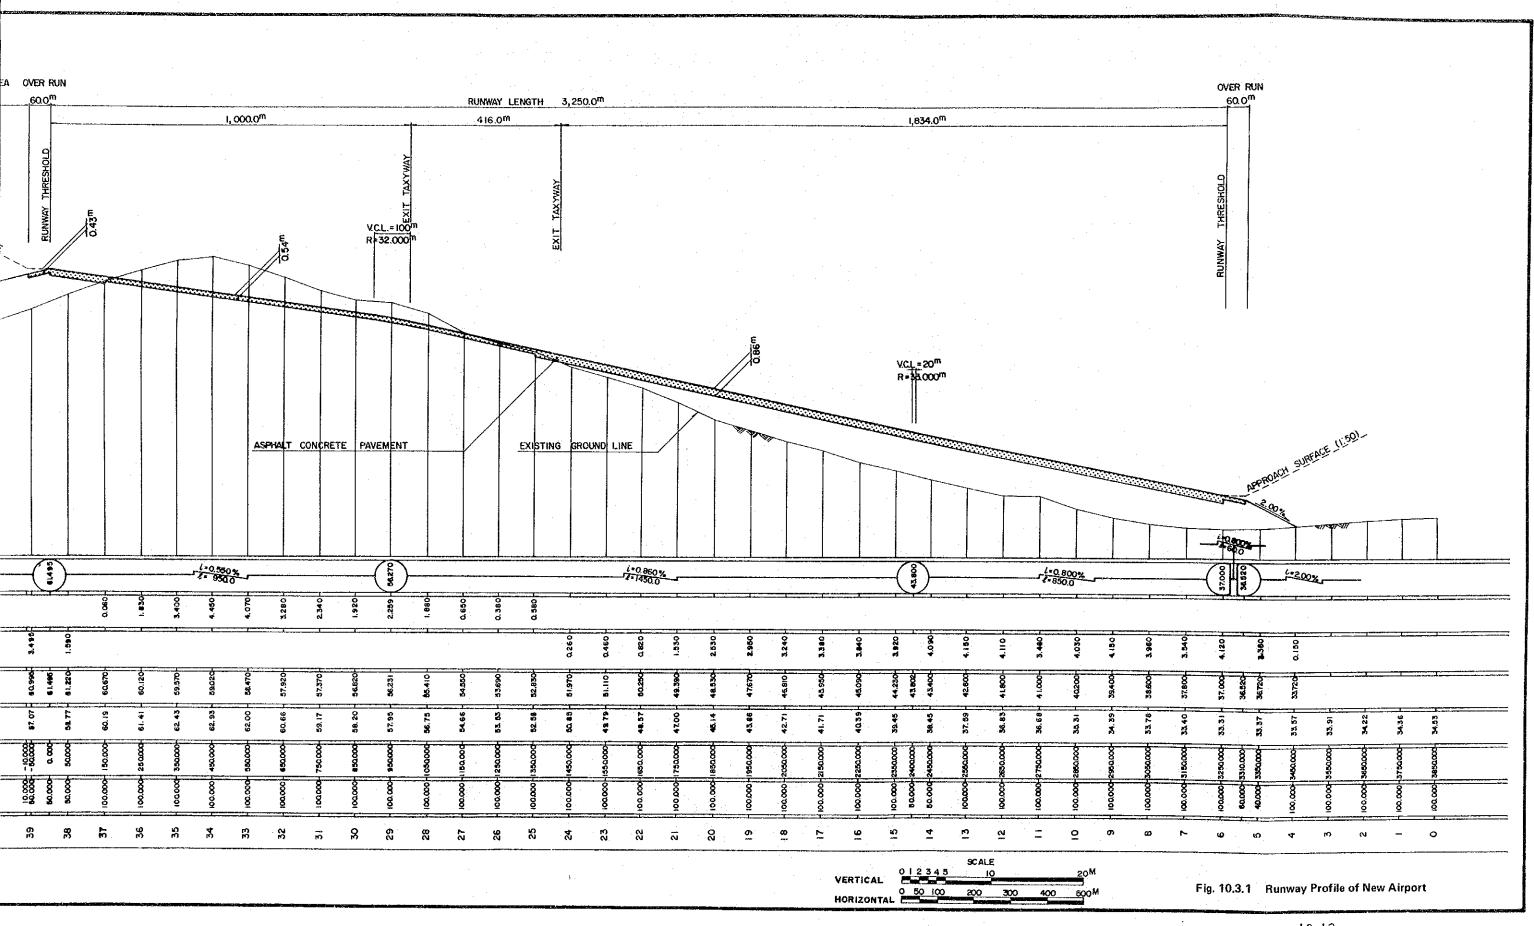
and 2 show the runway profile and typical cross sections, respectively.
